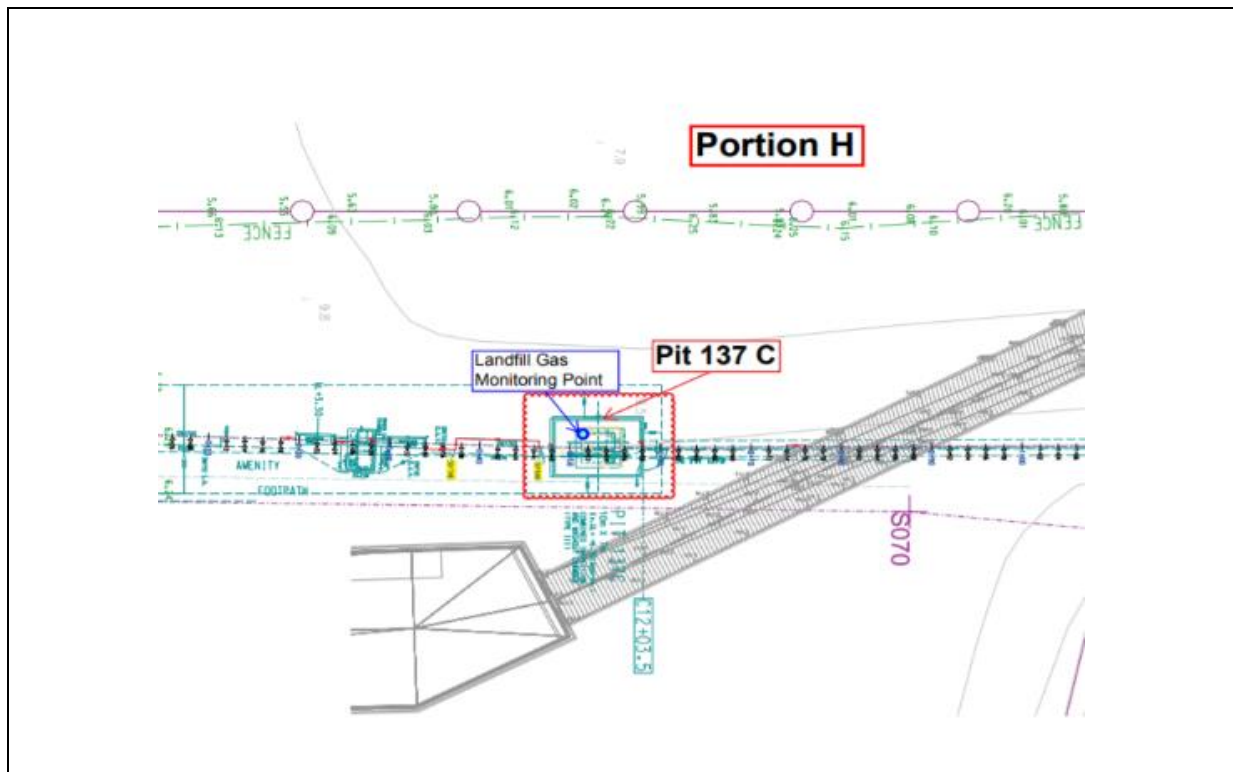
Monitoring Location - Pit 137C (137 Pit C)
